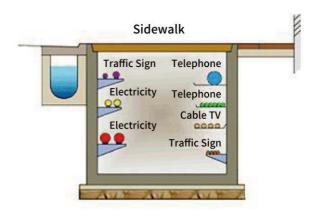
Diagram of Cable Trench [62]
